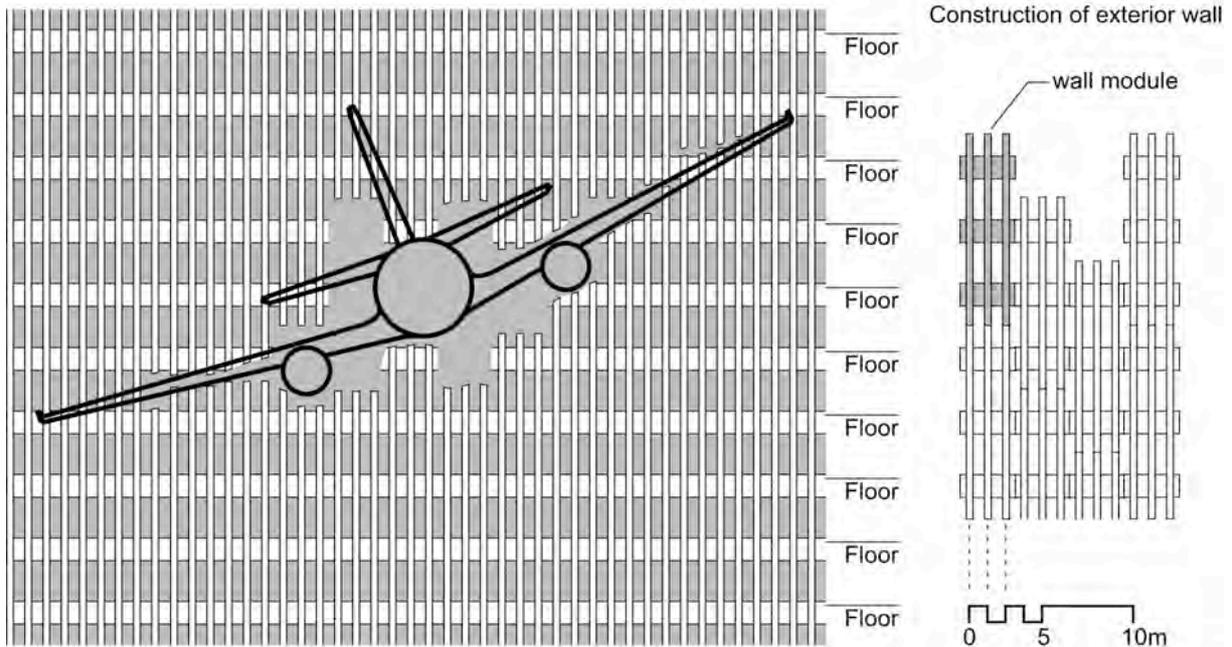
Impact damage to exterior columns of WTC 1 (left) and construction of the exterior wall with modules (right)
